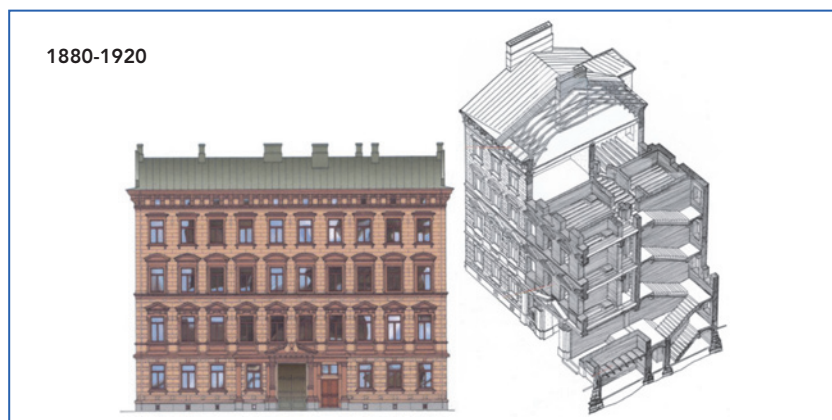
Example of a dwelling constructed in 1891. Left: façade 1:250, right: cross section. Typical structures: floor: wooden structure, walls between dwellings: brick 300...600 mm [5].
